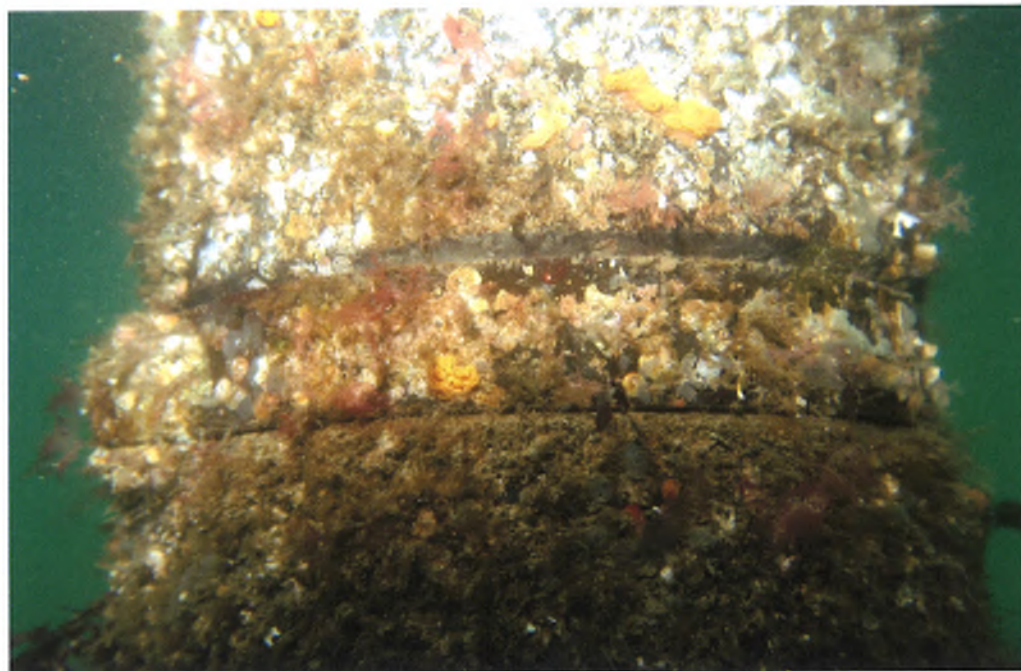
Float B, Pile No. B-18 - Note the band around this composite pile in the submerged zone. The band appears to be manufactured of recycled plastic and is assumed to cover a splice where drill string sections have been screwed together. No evidence of any rust bleeding was noted.
